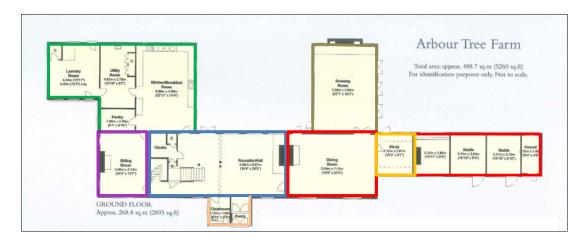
A small addition (right) to the L-shaped range of outbuildings was built in 1917-1925.
